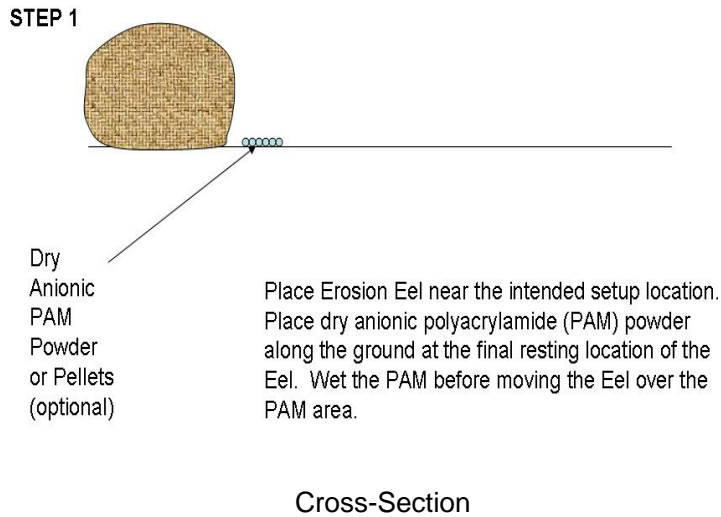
Installation/Pinning for Erosion EELs™ Placed over Rock/Concrete Surface
